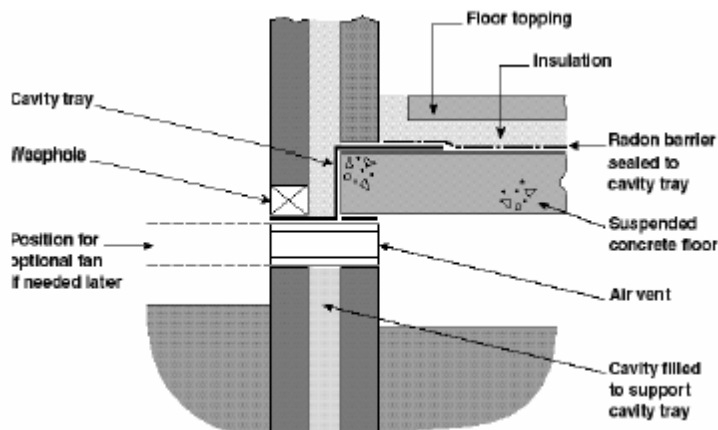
Possible working detail for full radon protection in a suspended concrete floor, showing positioning of membrane (BRE) [9].
